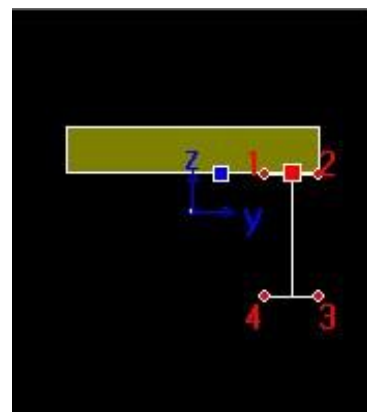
Transverse cross beam elements between two main girders 50m span
